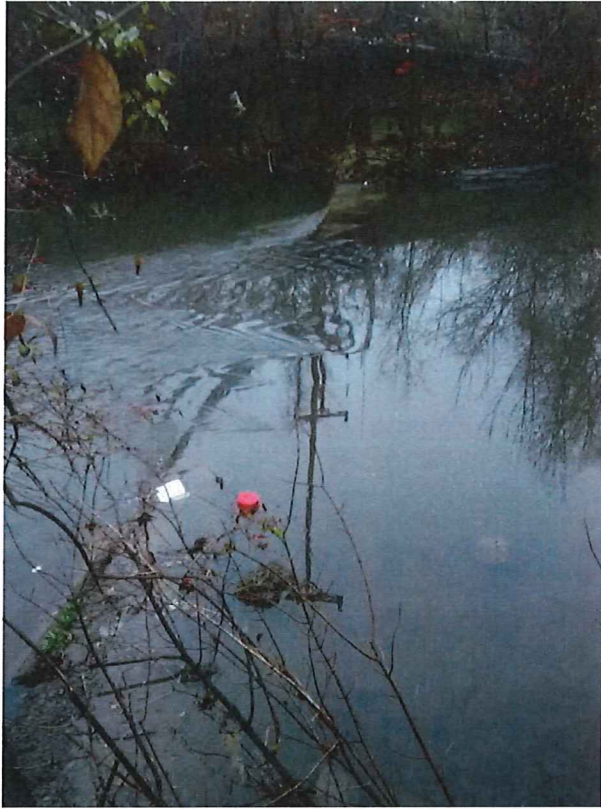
(Section 3 – south bank looking across river): Concrete dam in river mostly submerged
